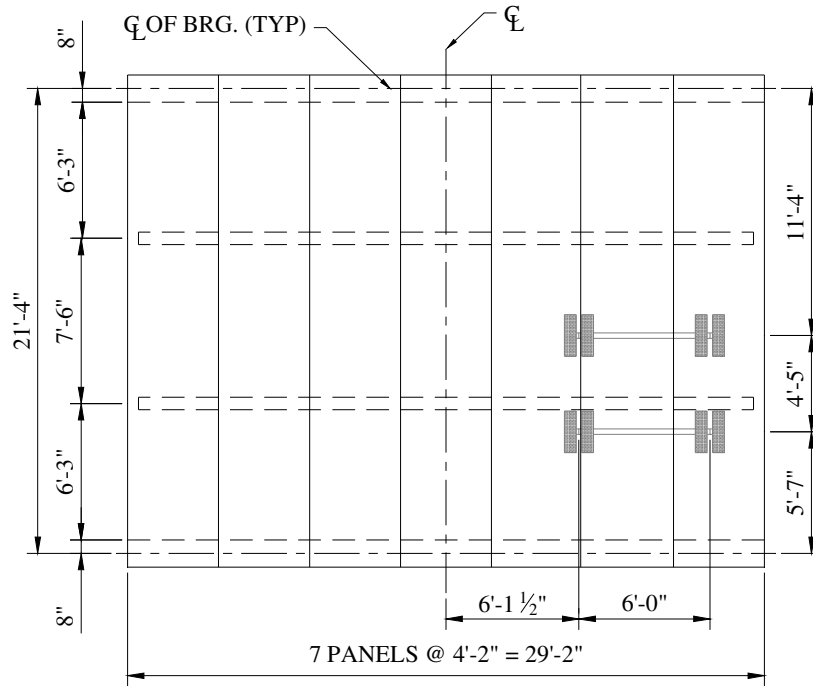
Controlling Load Position for Angelica Bridge, Plan View
